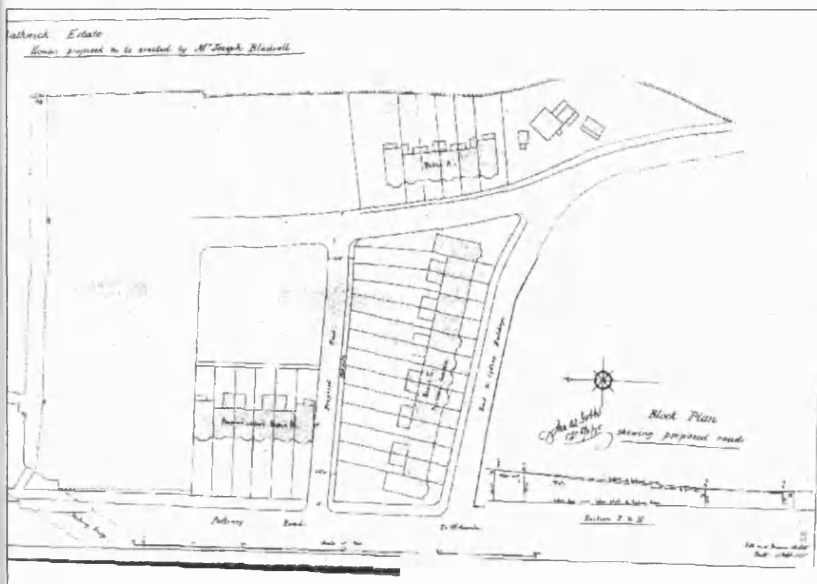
Building Control Block Plan by Gill & Browne 28 Sept'r 1875 for two blocks of 6 houses and one block of 14: total 26 houses. Signed in approval Thos. W. Gibbs 8/11/75. Building Control Ref: C34
